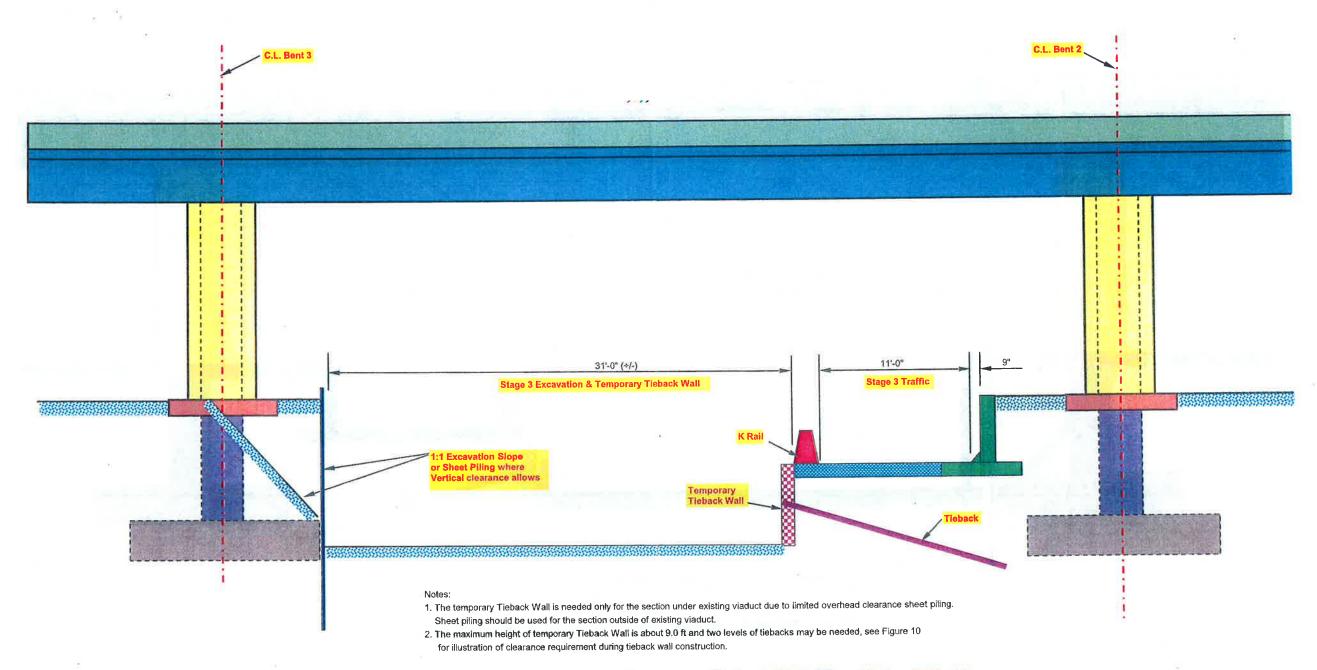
Stage 3 - Construct a Temporary Tieback Wall (Max. High = 9.0' +/-)
